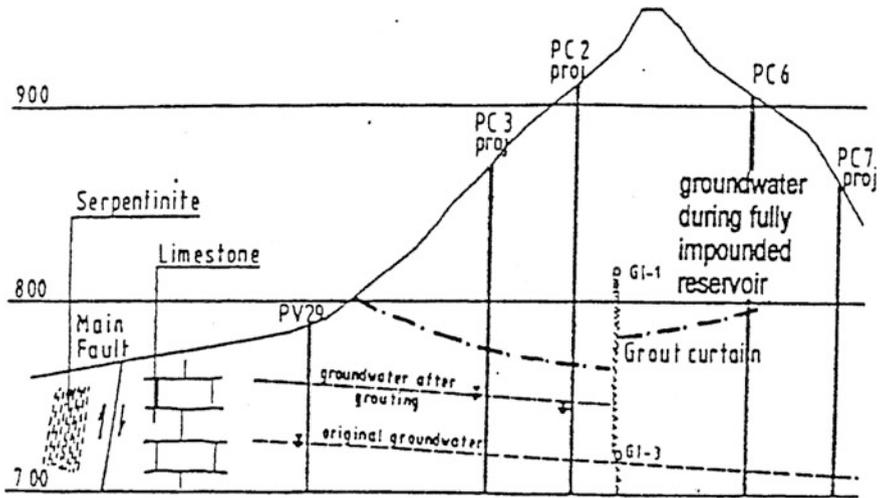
Pueblo Viejo Dam. Rise of groundwater table in front of the curtain due to grouting
